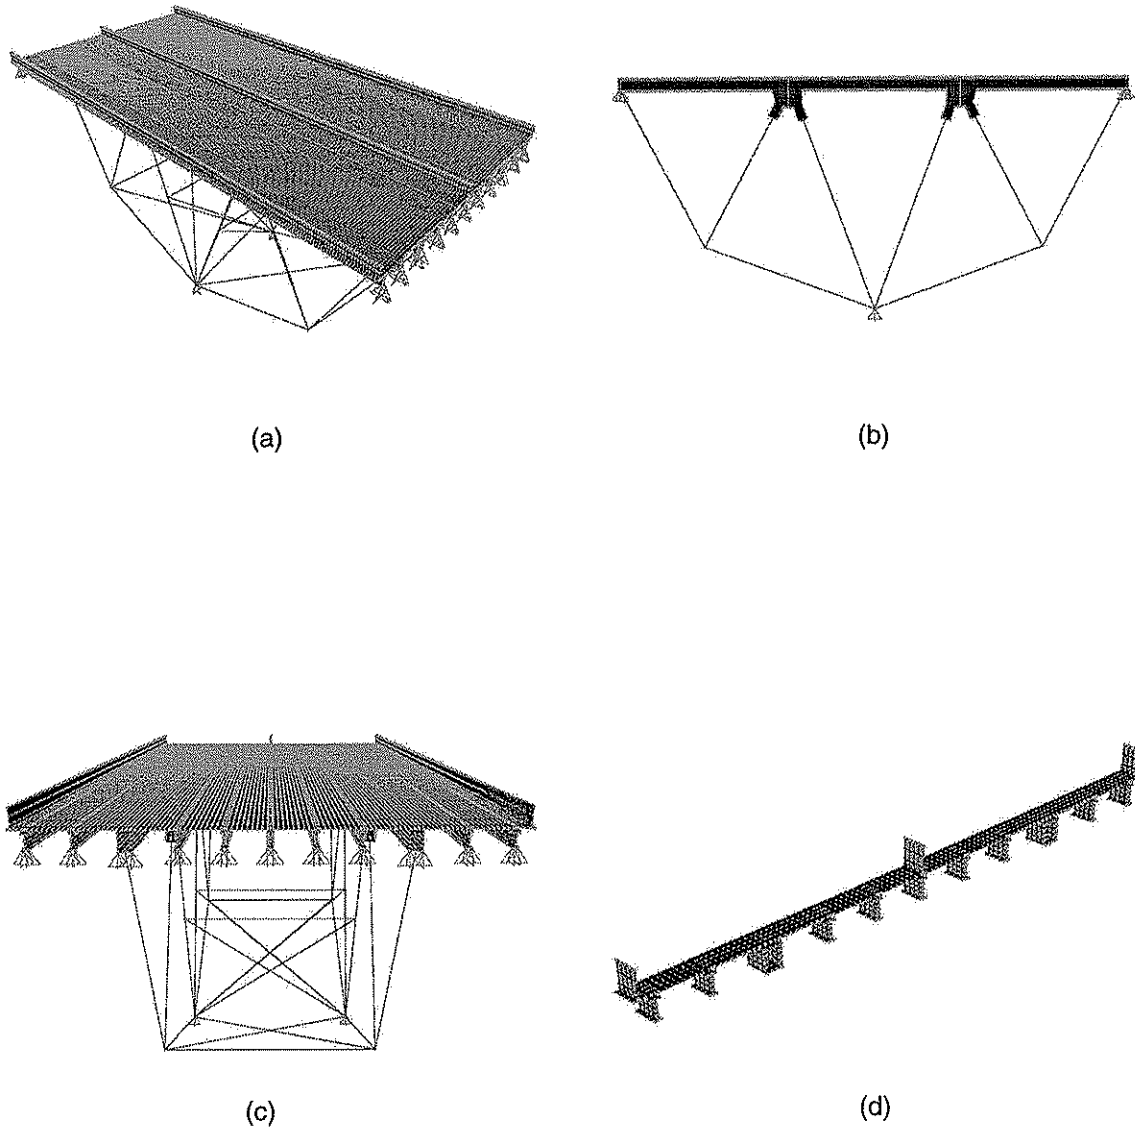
Views of the lateral load distribution model: (a) Three-dimensional view looking north and east; (b) Elevation view looking west; (c) Three-dimensional view looking north; (d) Three-dimensional section view.
